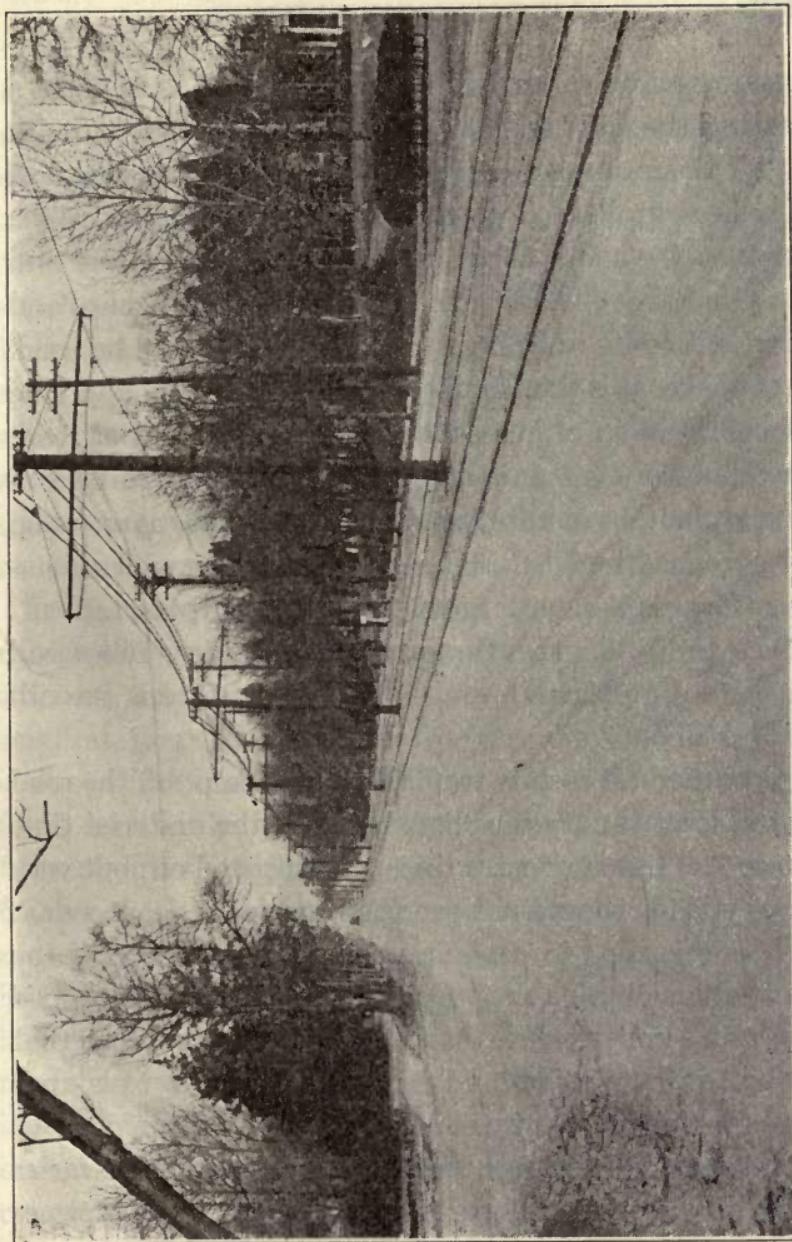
Completed asphaltic concrete road. (Chevy Chase Road, near Washington, D. C.)
